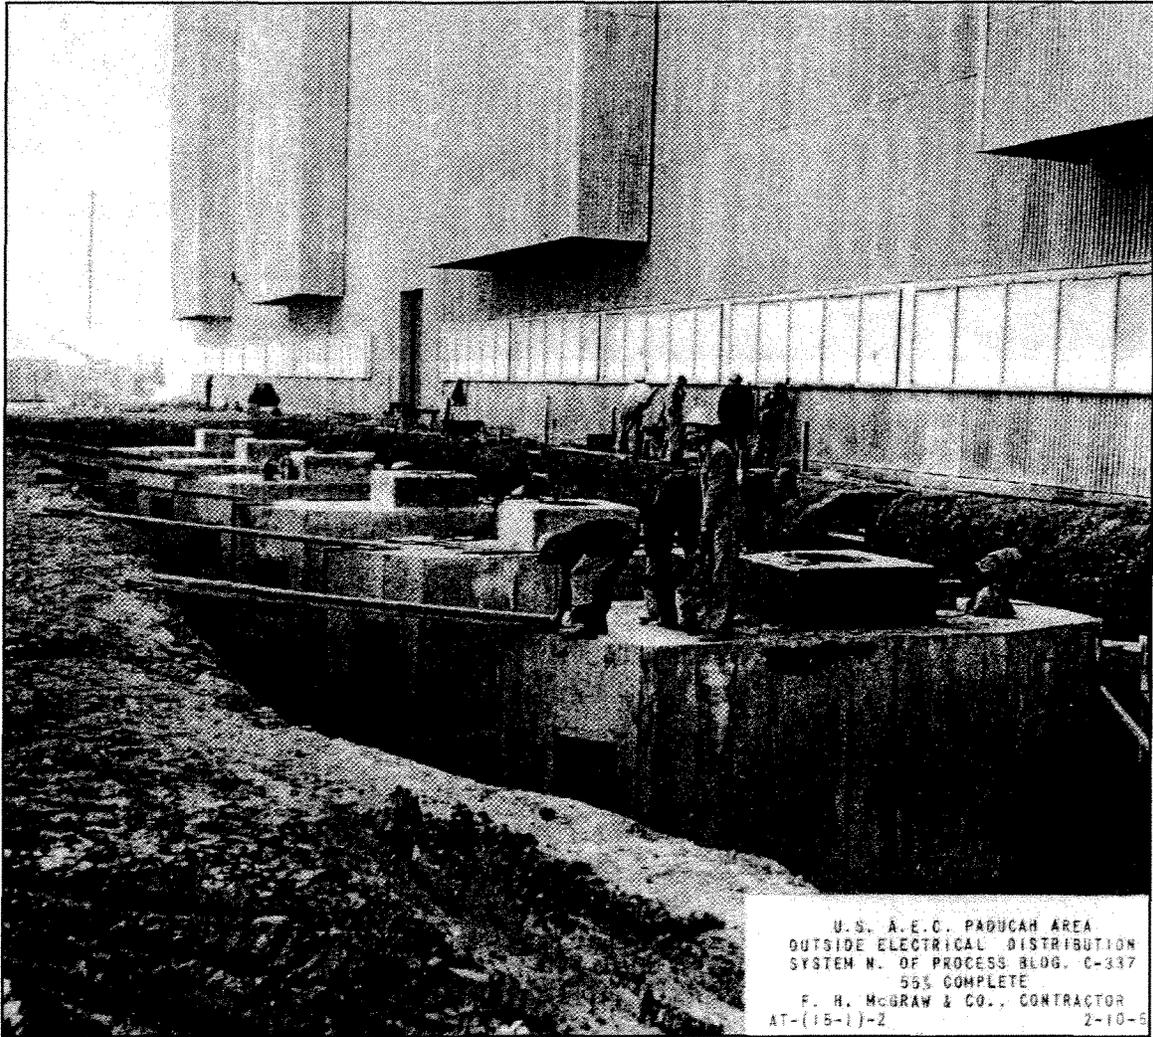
Construction of the outside electrical distribution system for Building C-337 in February 1954.
